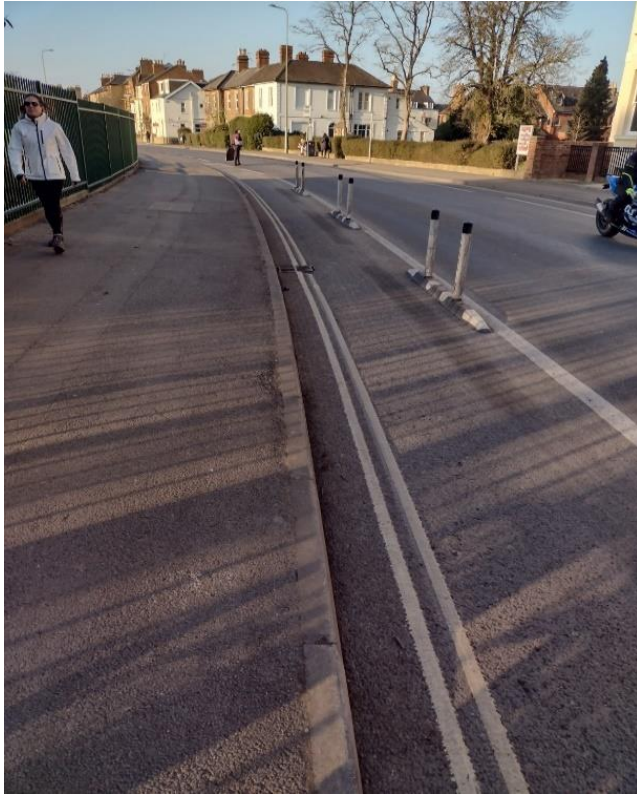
Quickway, Iffley Road, showing cycle path junction details
